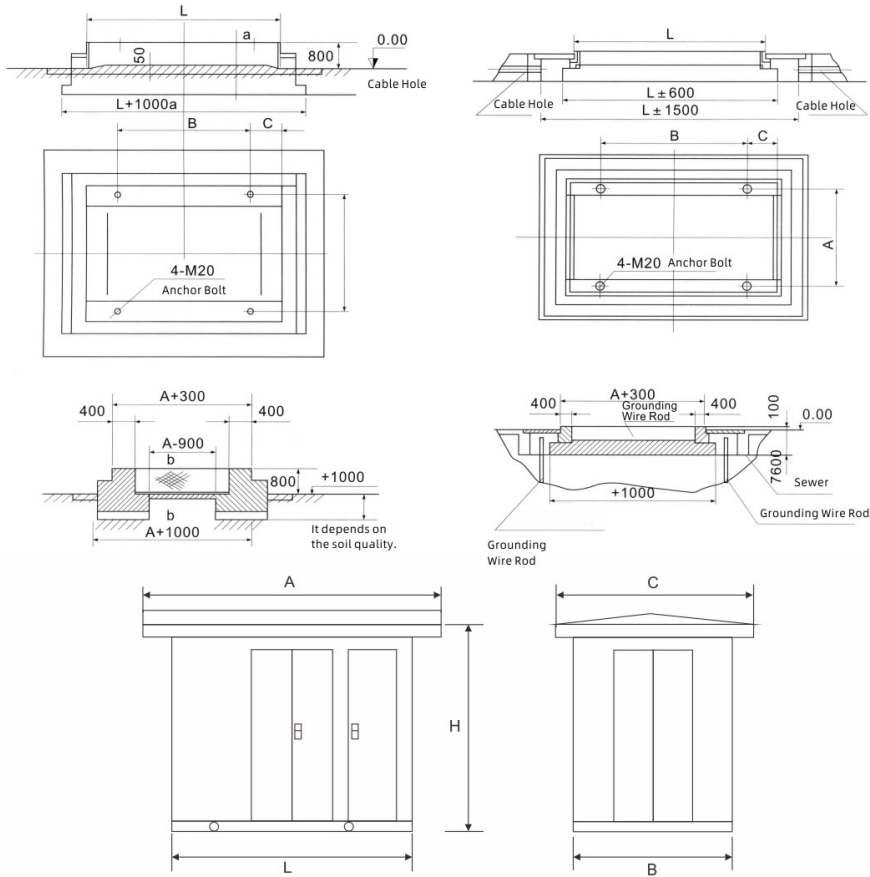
Outline Drawing of YBM and YBP (ZBW) Series Prefabricated Substations (in "Mu"-shaped Arrangement)
